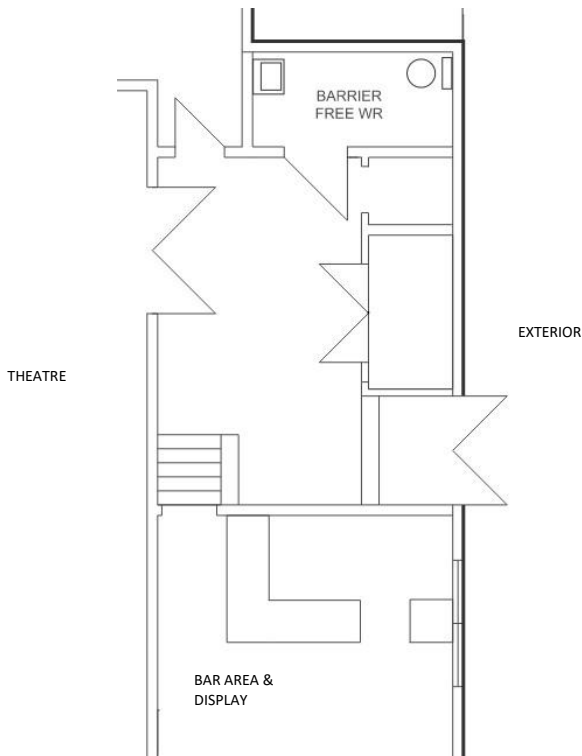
Existing main floor "Barrier-free" washroom near bar area
